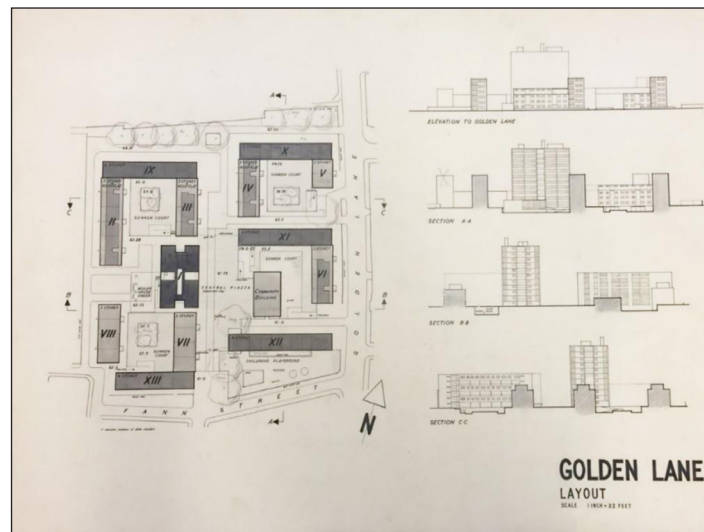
Original proposal with site layout and sectional elevation (Hardwood, 2011).
